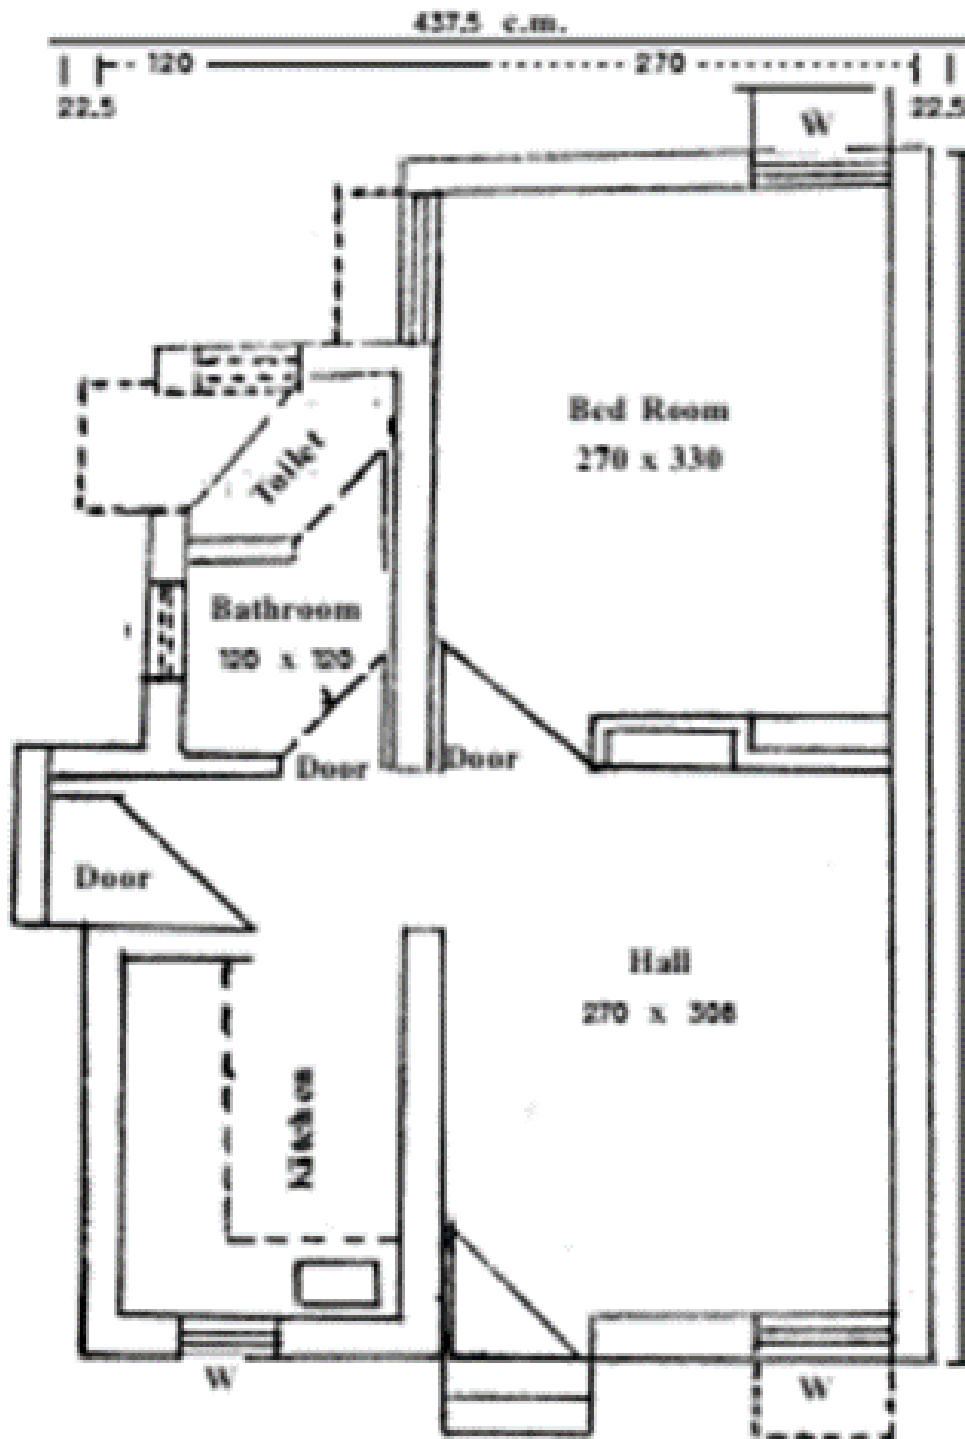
Low income group house plan Plinch area 386 sq.ft
